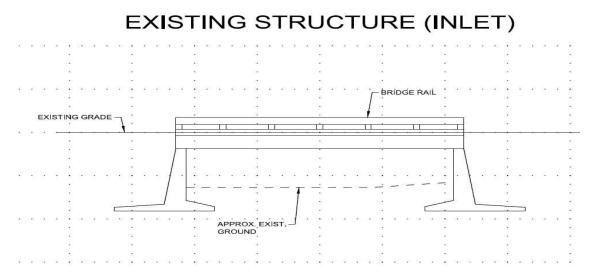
Existing Bridge Profile of SR-1 over Branch, LM 2.89 structure as noted in 04/02/2018 TIR.
